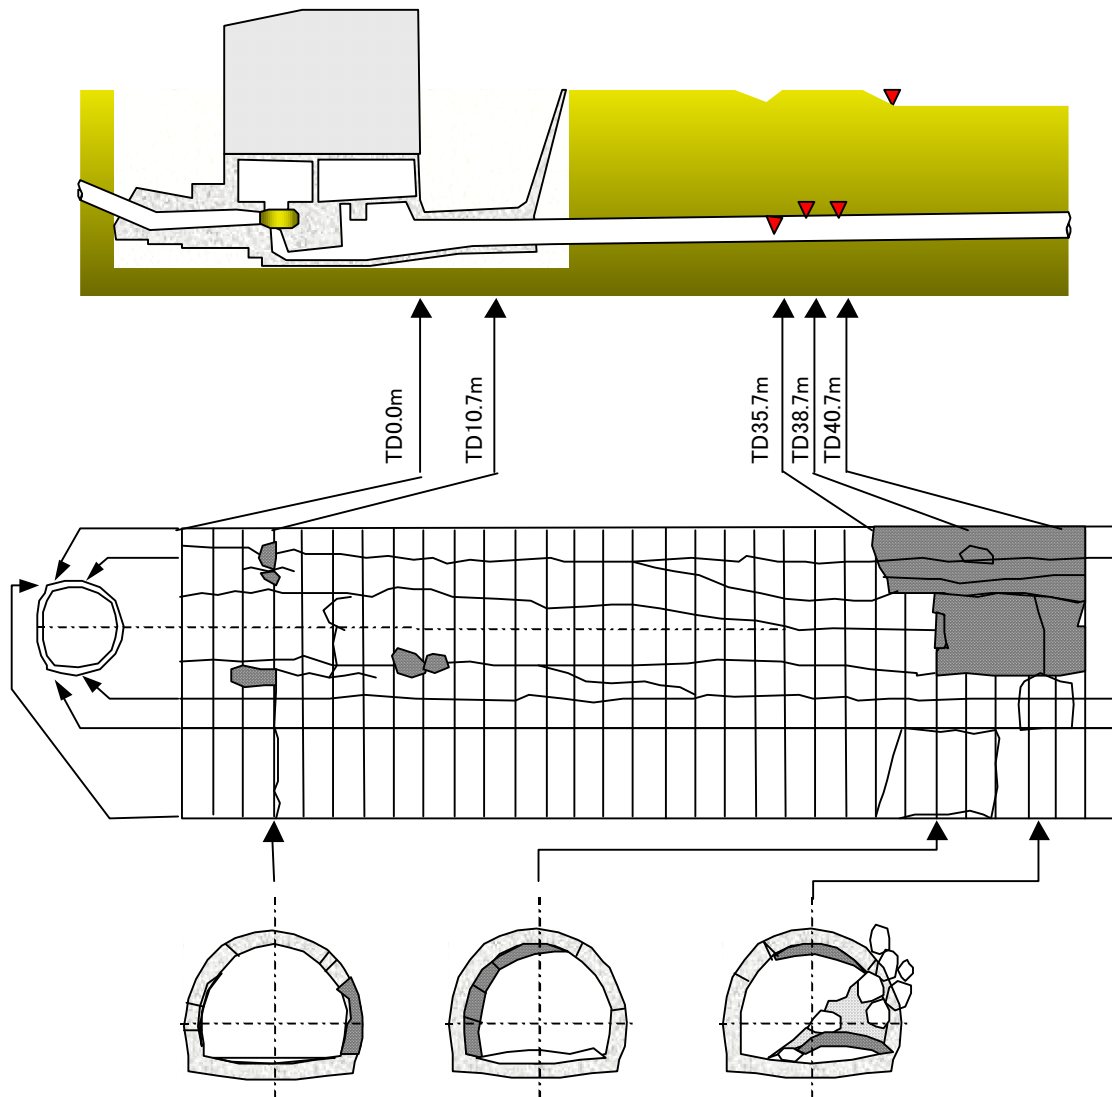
Development and cross-sections of cracked tunnel (after Hashimoto, 1998)
